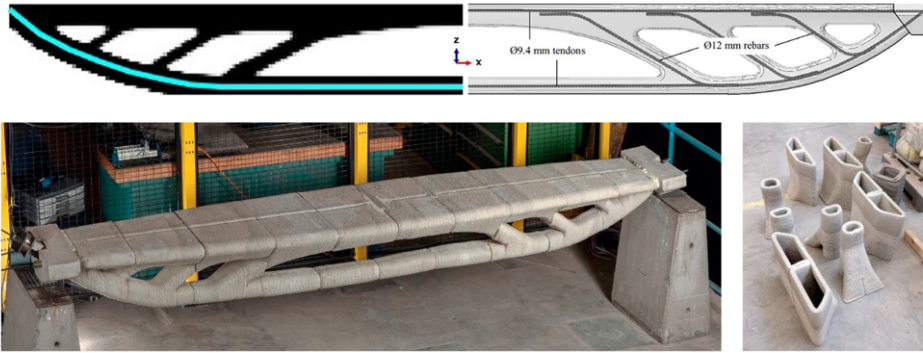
A lab-scale 3D printed and post-tensioned concrete girder constructed at Ghent University, adapted from [51, 52].
